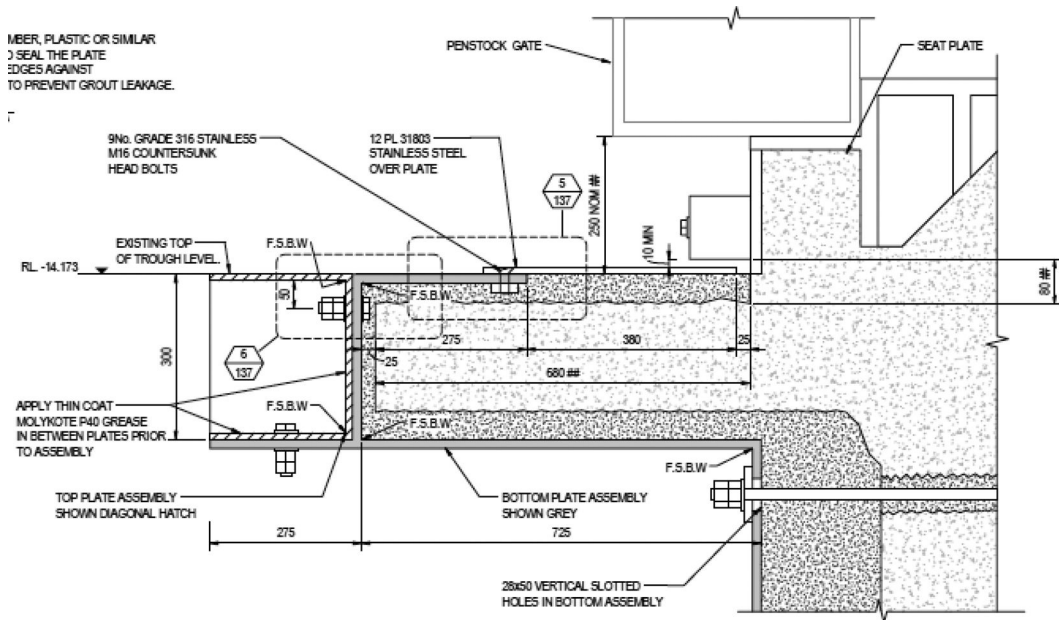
Cross section of initial weir plate design, installed to the concrete shaft wall and stabilising the penstock grate frame.
